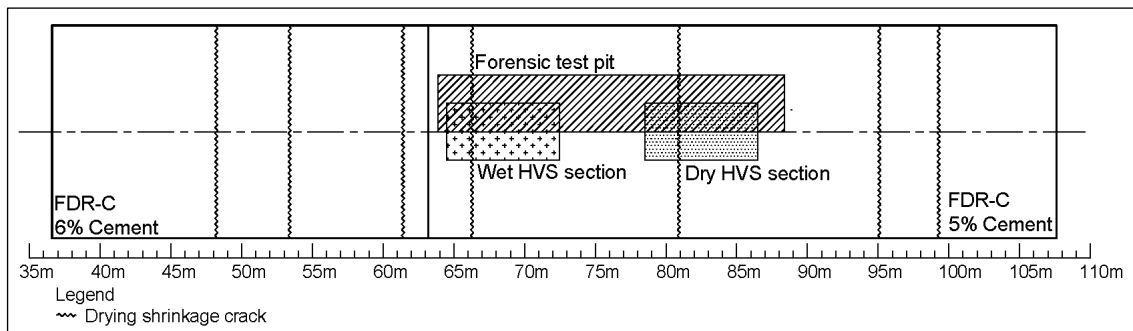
Layout of test sections and shrinkage cracks on the FDR-C test track lane.
